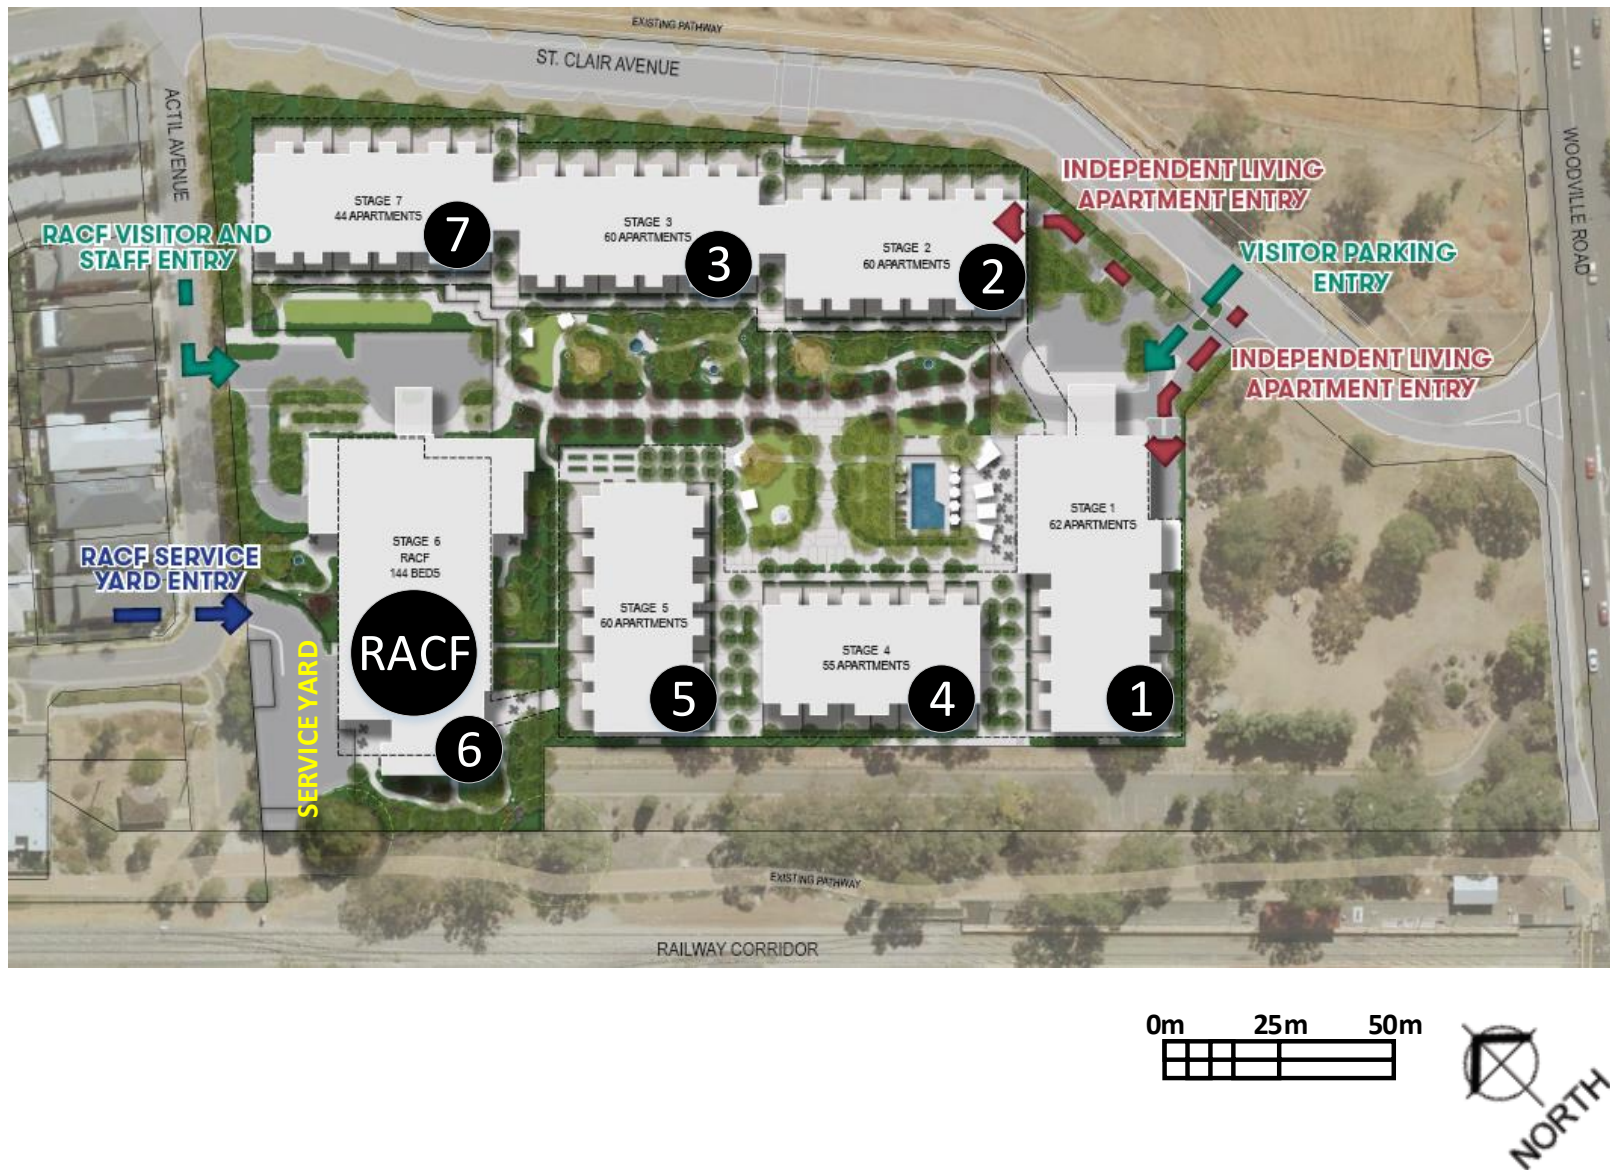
Plan layout of Development at site, reproduced from the Drawings (issued 12 December 2018). Building numbers referred to in Table 1 below are marked, key site access points are marked with arrows.
